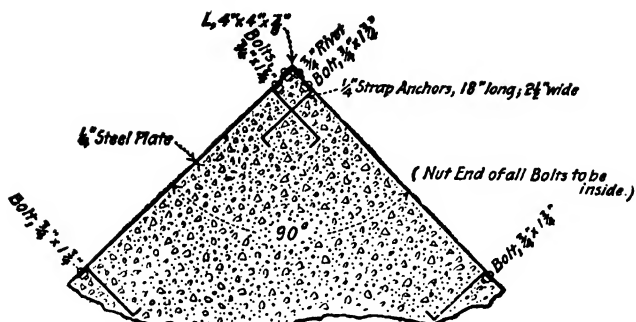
h*.—Section of Steel Nose of Pier.
